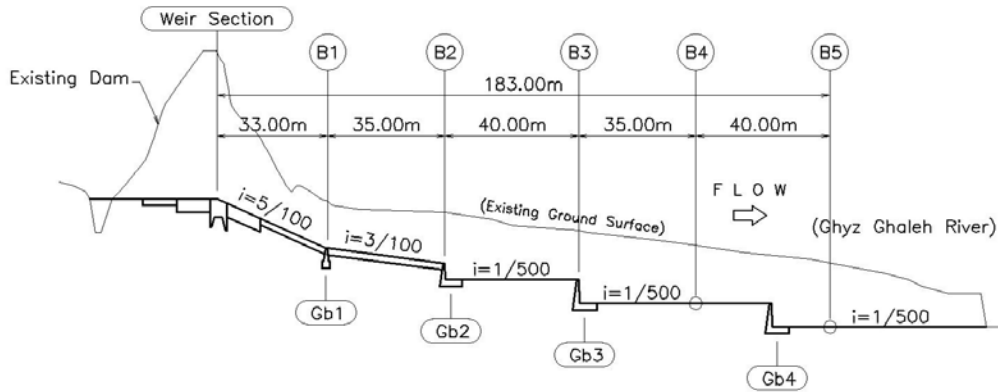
Schematic Profile Arrangement for Bed Protection
